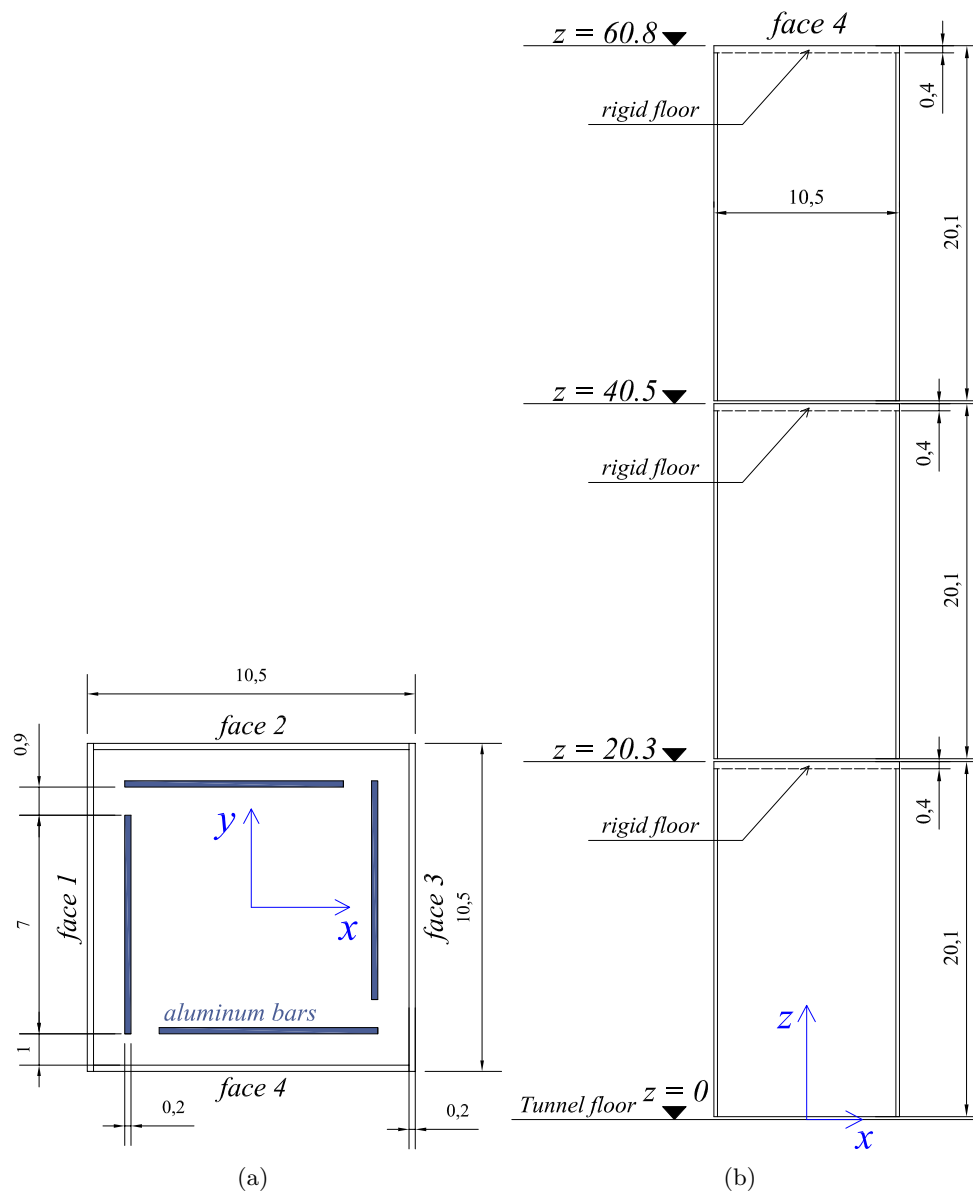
Dimensional drawing of the model: a) plan view; b) side view (face 4).
